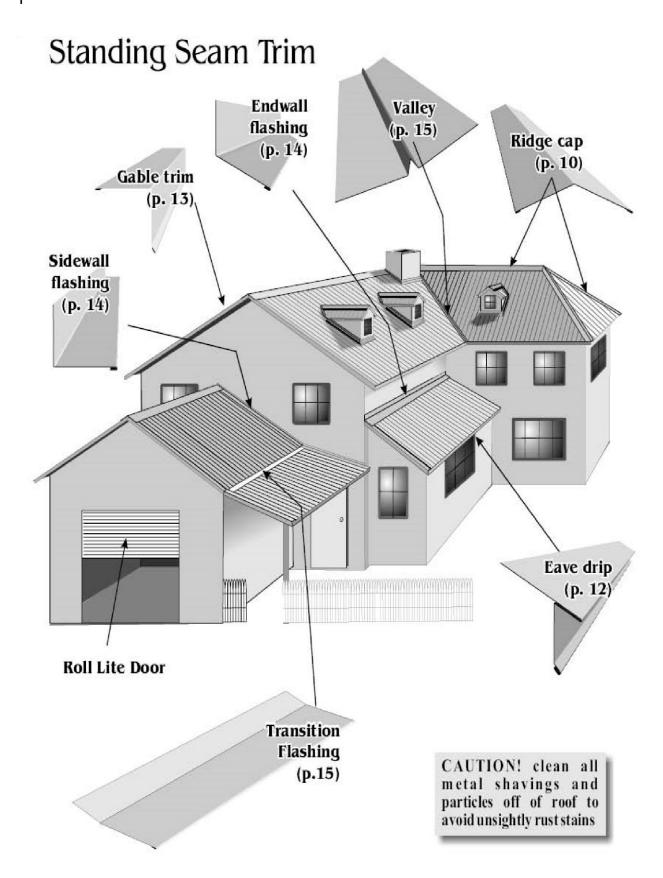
Roofing trims and flashings are named by the location or function of that particular piece on the building.
